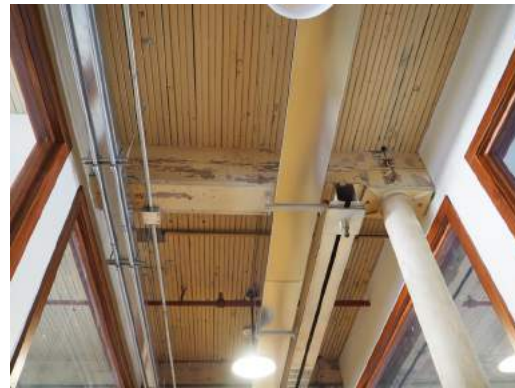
High modern clerestory windows to create defined rooms for studios/offices and allow natural light
